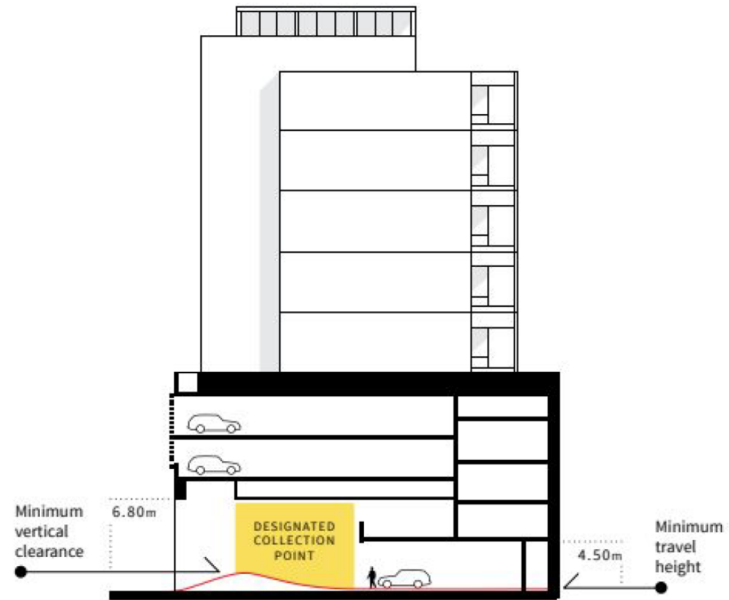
Minimum floor to ceiling heights. Source: City and Gateway Urban Design Framework (NCA and ACT Government December 2018).
